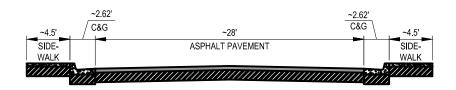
EXISTING ORTIZ DRIVE TYPICAL SECTION
